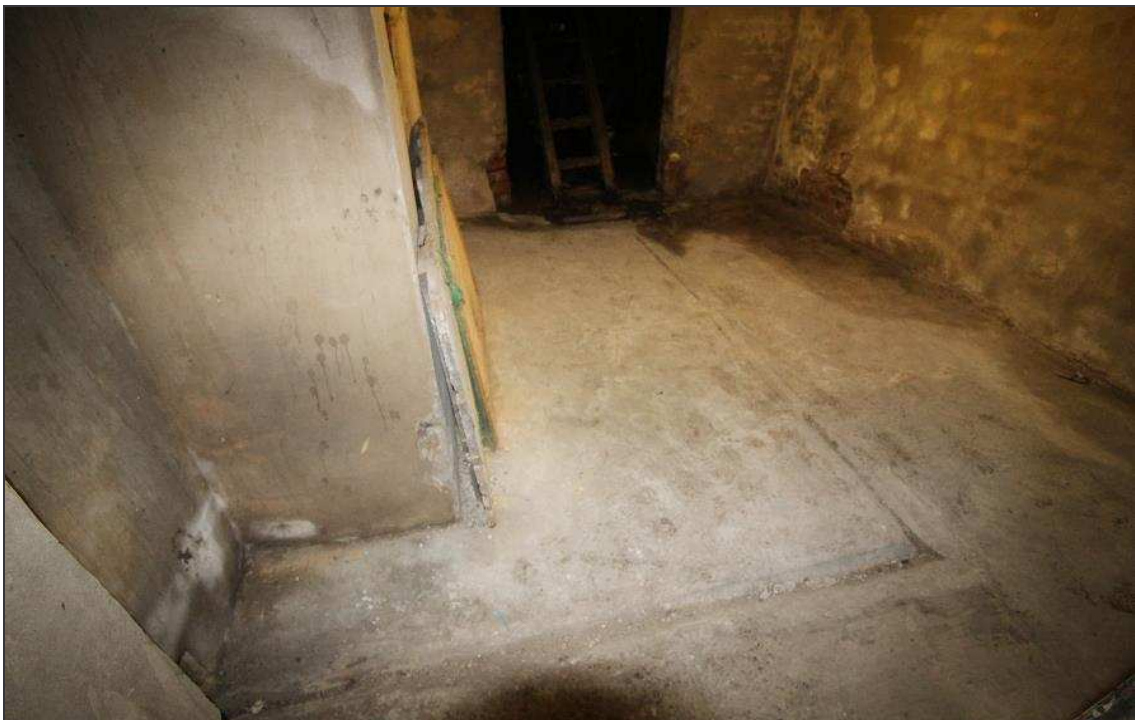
Concrete floor of the first room, detailing drainage channel formed within it
